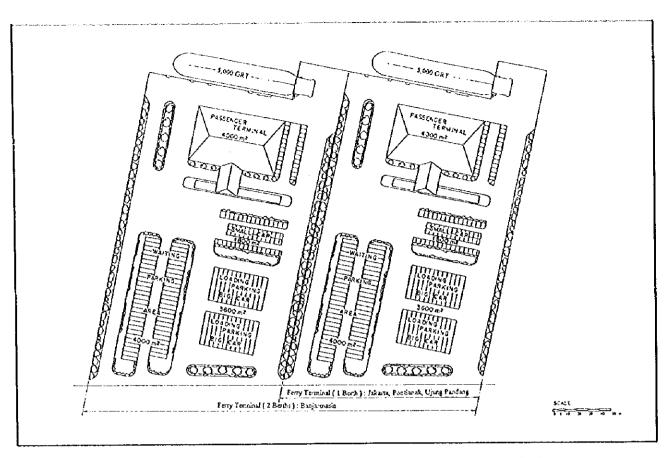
General Layout Plan of Ferry Terminal (5,000 GRT)
